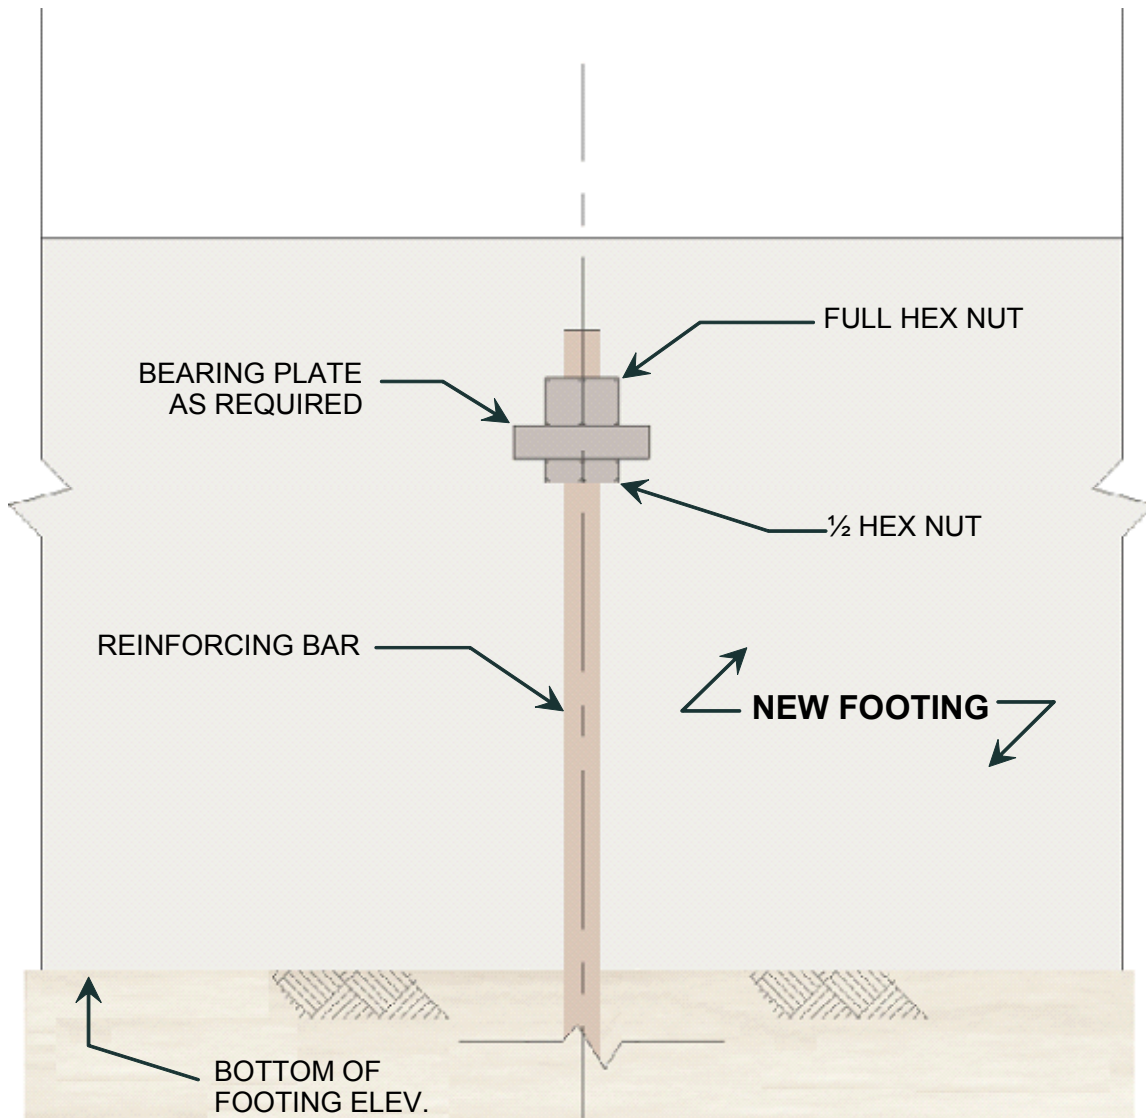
Pile to Footing Connection (compression and tension loads).
